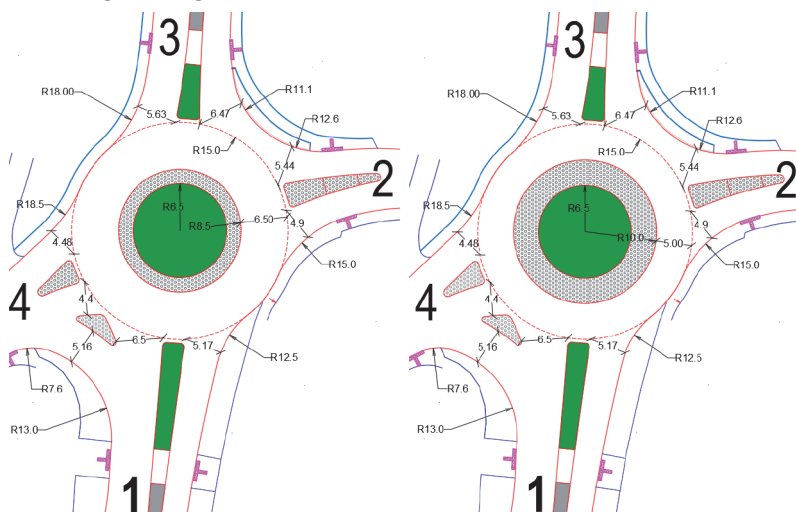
Geometric elements of the existing roundabout (left) and the proposed reconstruction layout (right)
